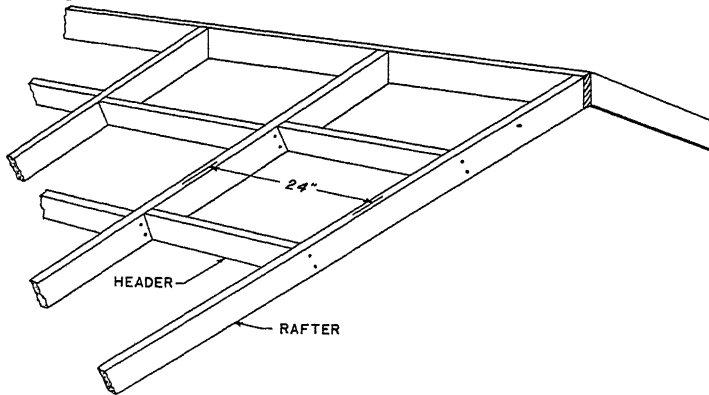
The header method of framing for corrugated sheets has excellent nailing surface. Long nails can be used when nailing the roof on. This method of framing is unsuitable, except for corrugated sheets.
